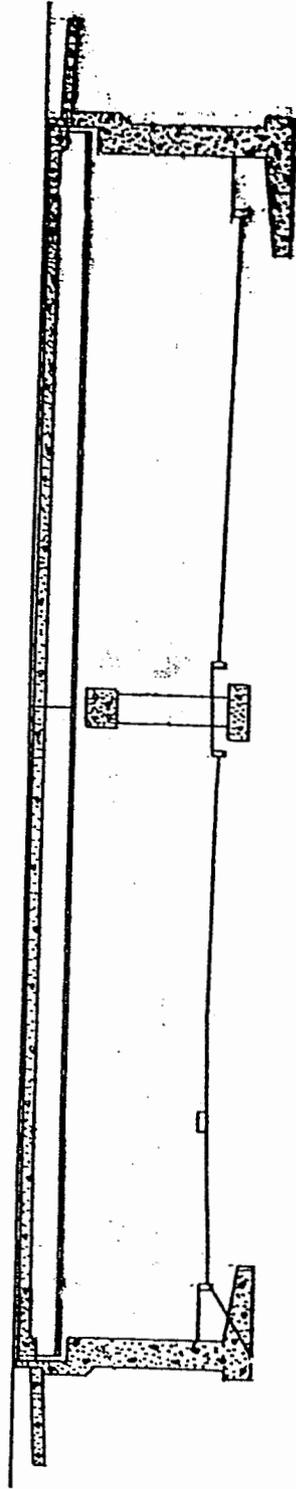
Hartford Ave. - West Bridge #608: Bridge Plan
